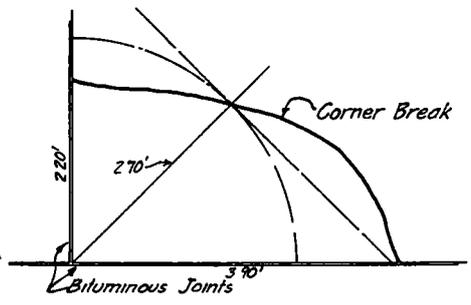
Four-inch Concrete Sidewalk adjacent to a driveway
